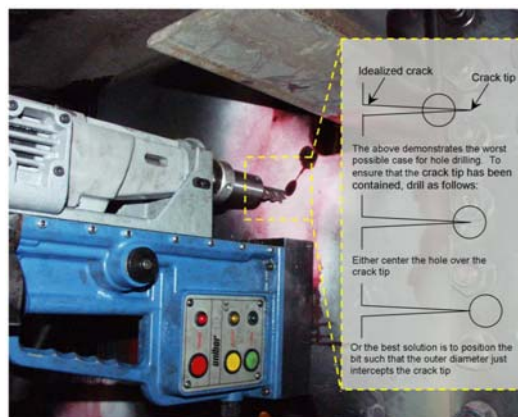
Hole-drilling and proper positioning for crack containment [5]
